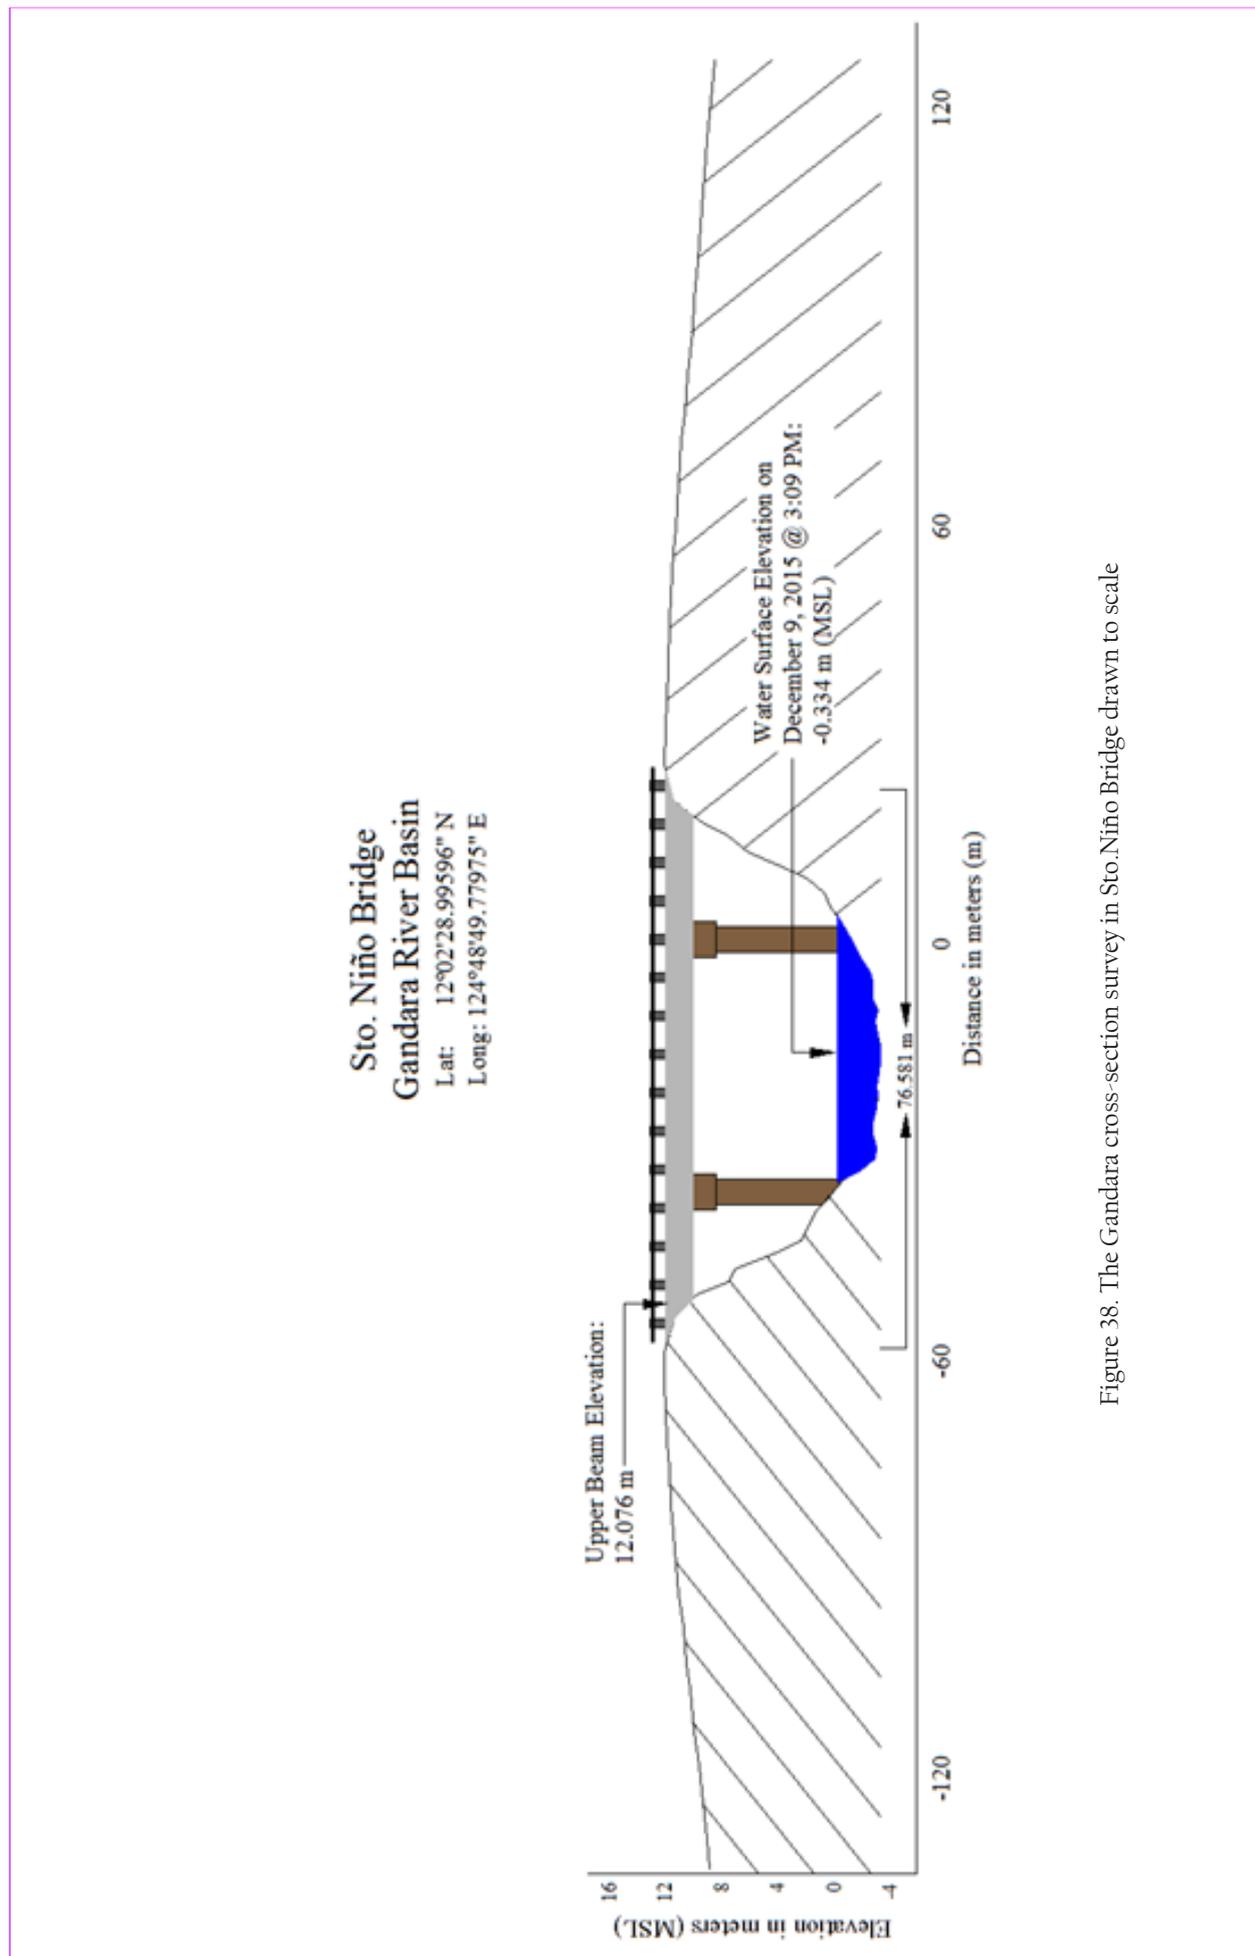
The Gandara cross-section survey in Sto.Niño Bridge drawn to scale
